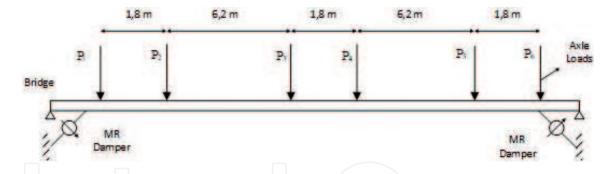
Railway bridge with MR dampers acted on moving axle loads.
